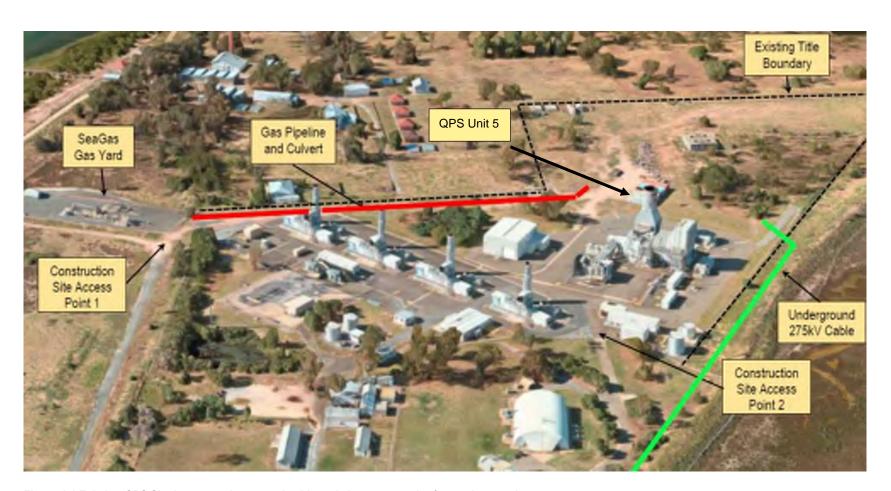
Existing QPS Site Layout and proposed cable and site access point for northern option
